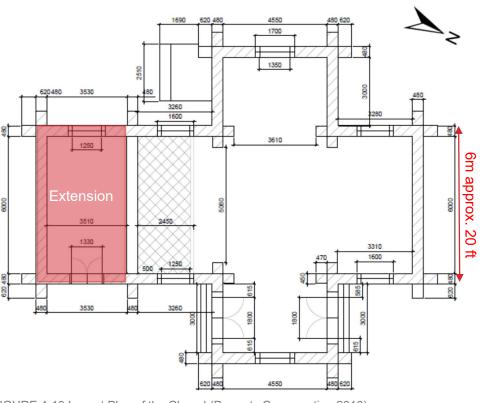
Layout Plan of the Chapel (Property Conservation 2016)
